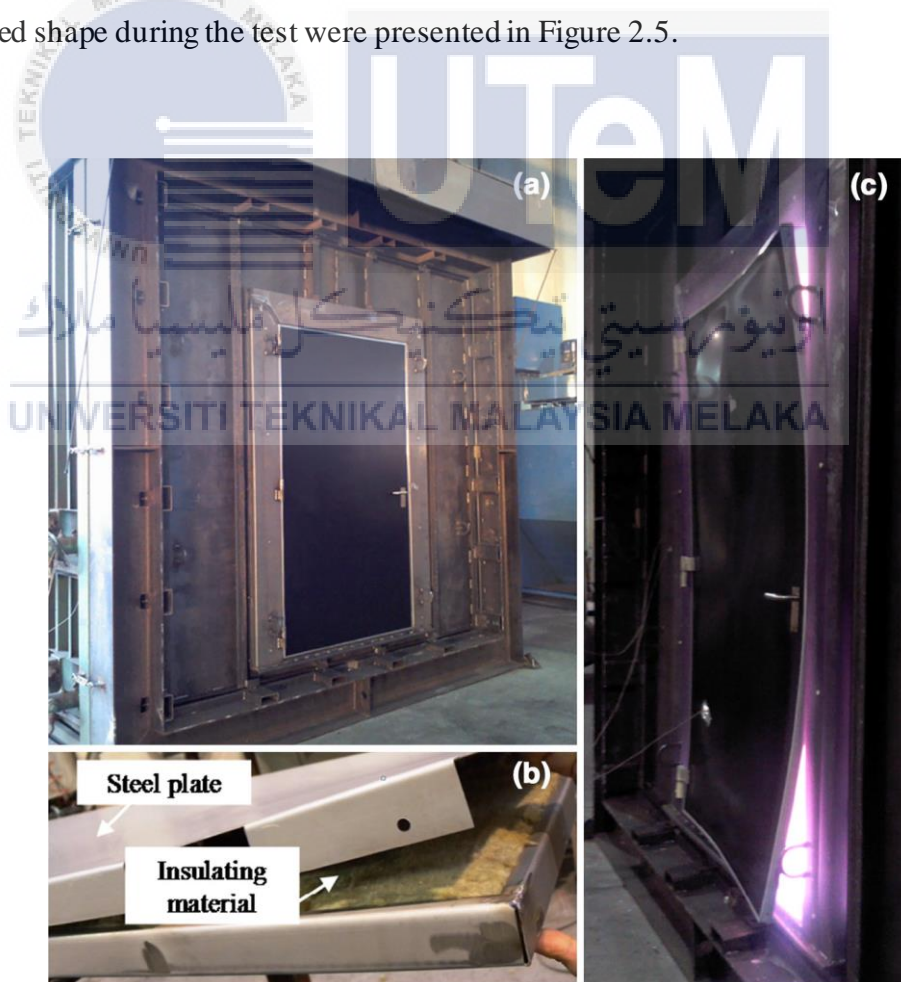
(a) Standard fire test set-up, (b) close view of fire door structure, and (c) deformed shape during the test (Moro et al., 2017)
